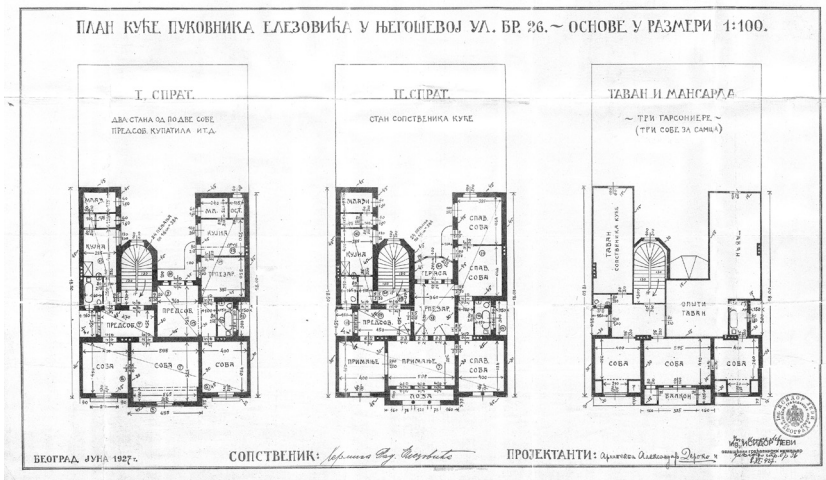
The floor plans for the Colonel Elezović apartment building. (IAB F. XI-30-1927)
